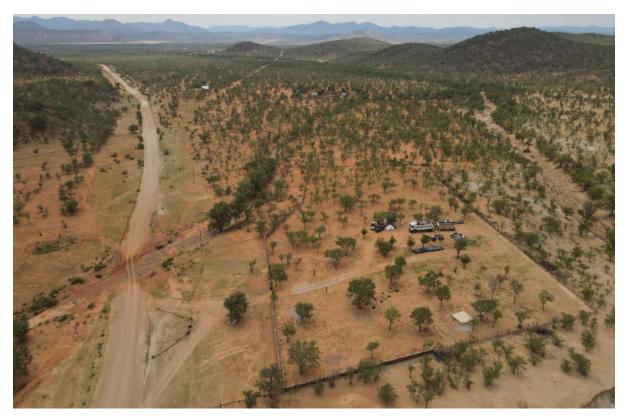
The existing road D3703 gravel road which stretches from Opuwo to Etanga.
